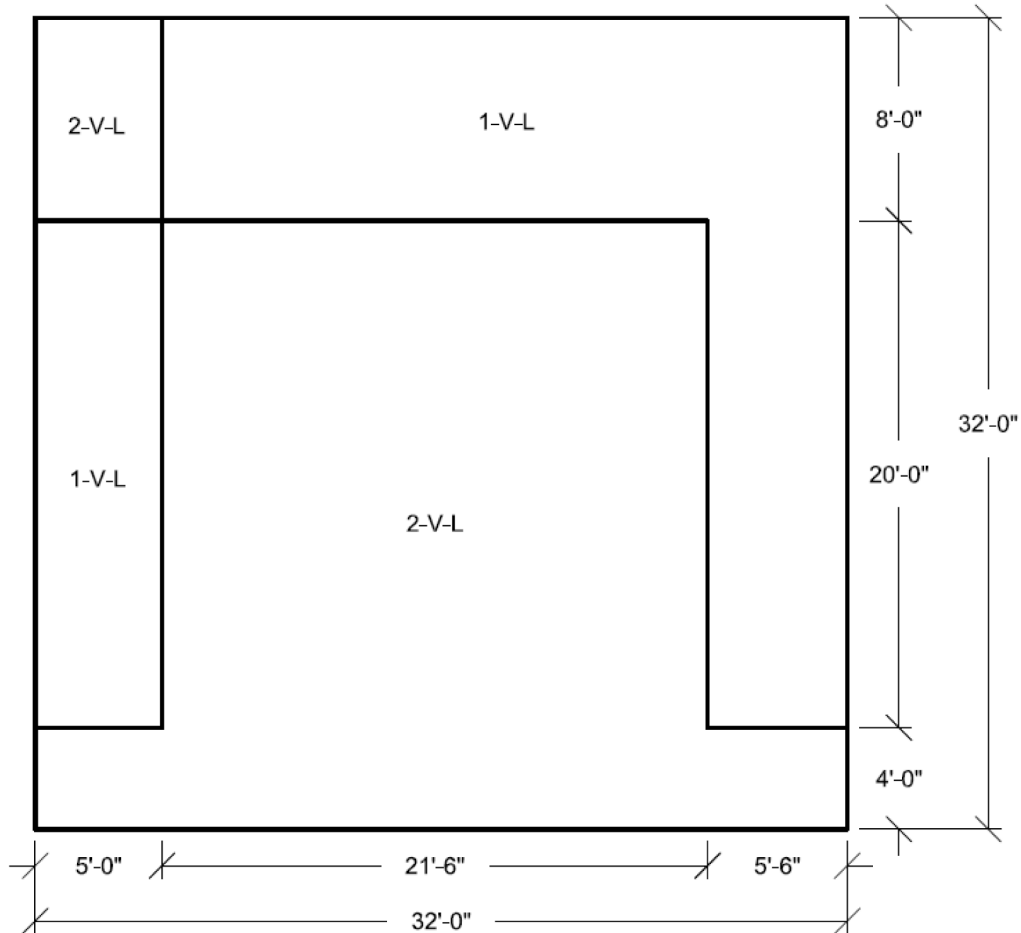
H.6-193 DGFOV Wall 13 Looking From Outside
